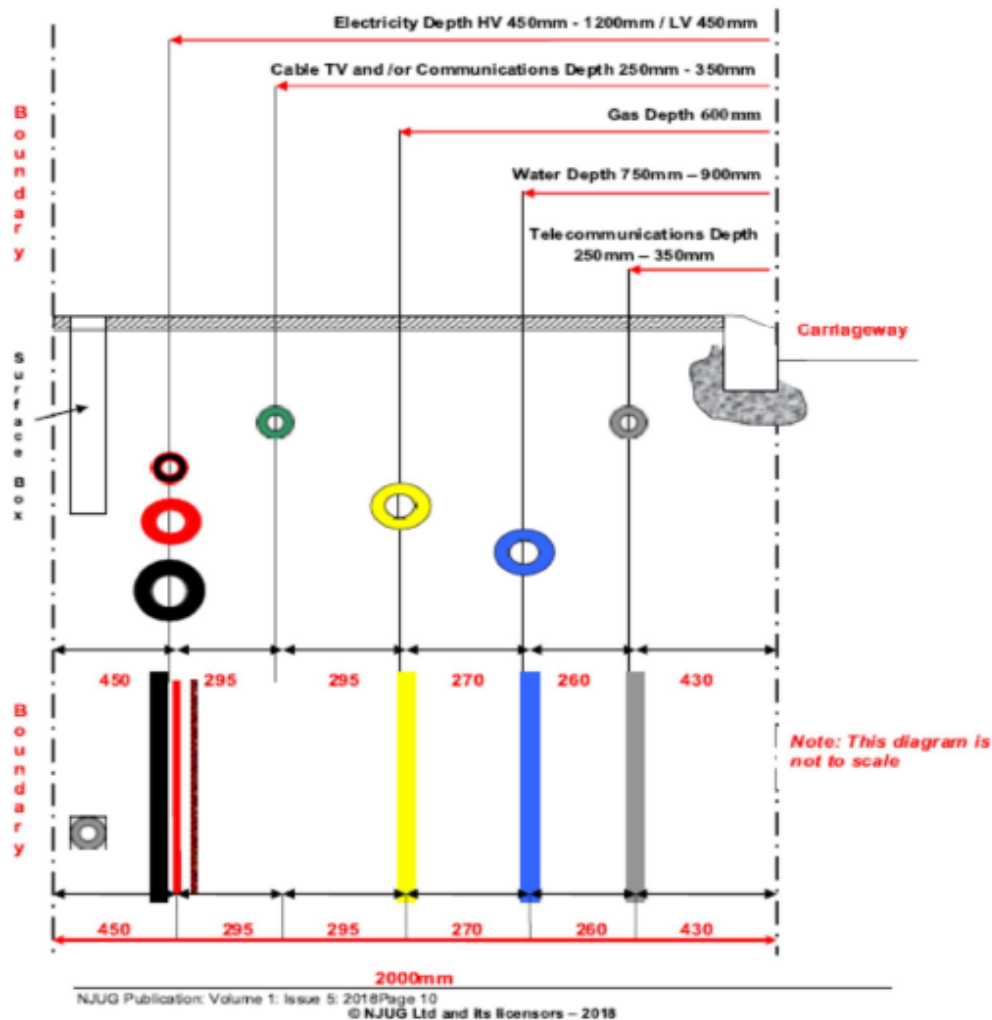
Recommended positioning of utility apparatus in a 2 metre footway
